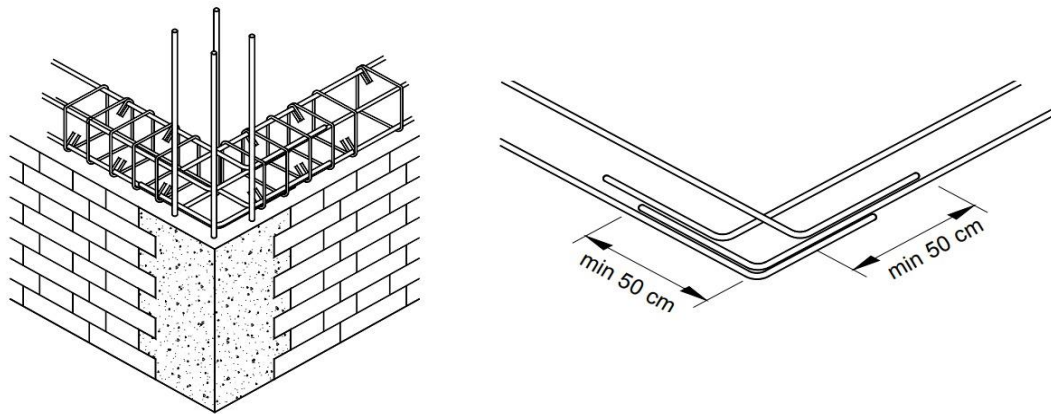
Tie-beam construction at wall intersections (left) and hooked anchorage for longitudinal reinforcement (right), (*Brzev, 2008*).
